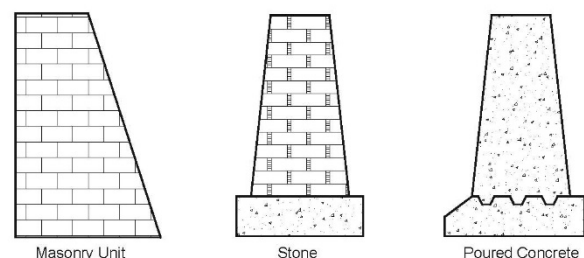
Typical section of a conventional gravity retaining walls (source: https://commons.wikimedia.org/wiki/File:Gravity_Walls.jpg)
